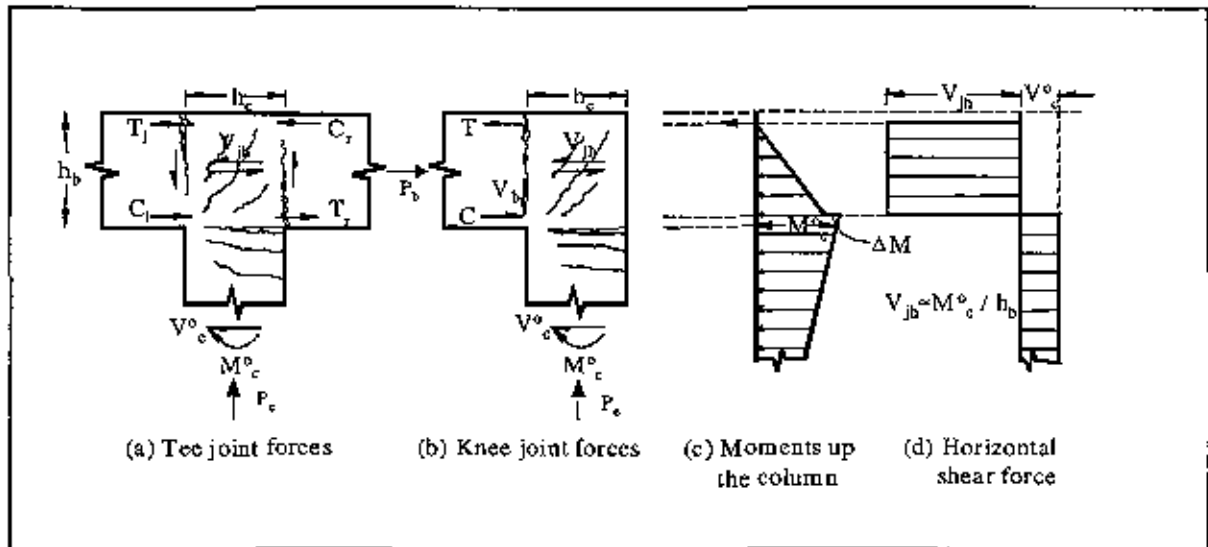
Average Horizontal Joint Shear Forces in Bridge Tee and Knee Joints [1]
